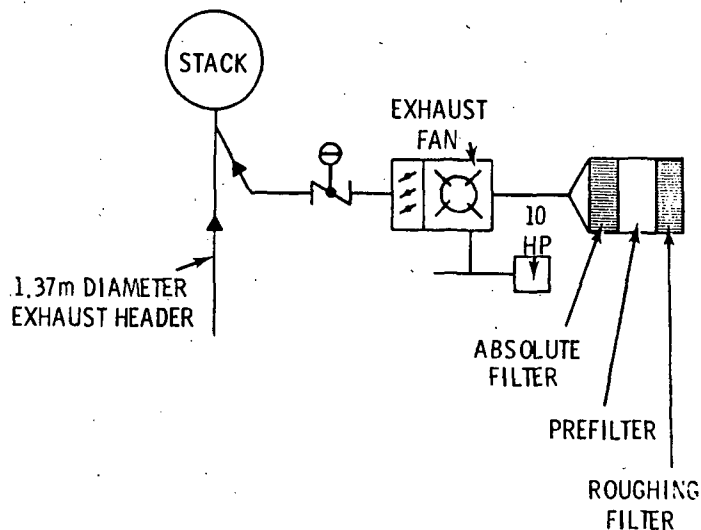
Waste Handling Building Ventilating Air System
